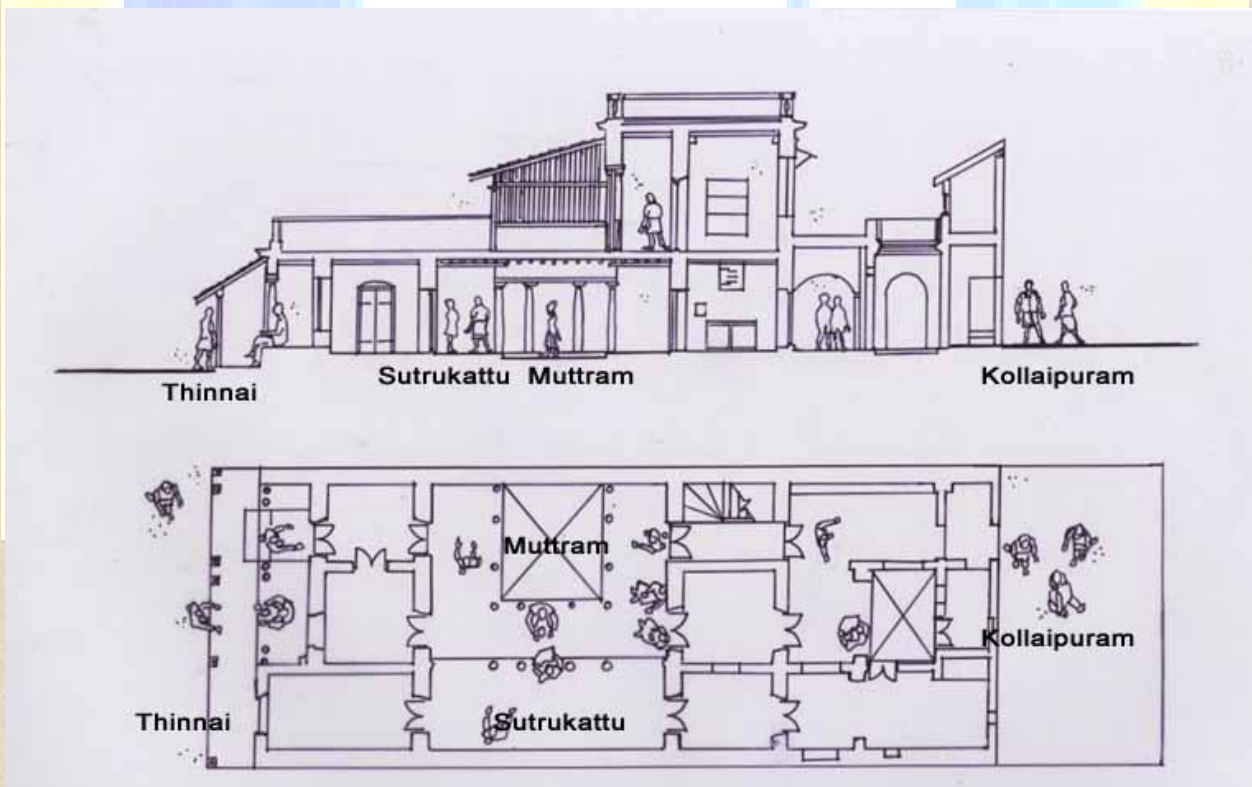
B showing the typical plan and section of traditional house with specified settings.
